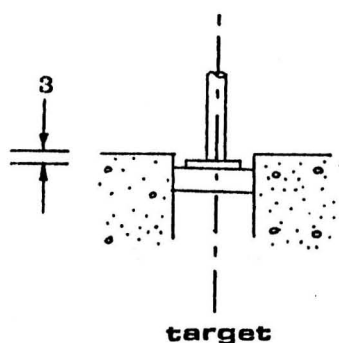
Dimensions of adaptors and target heights at Risley Park, all dimensions in millimetres.
